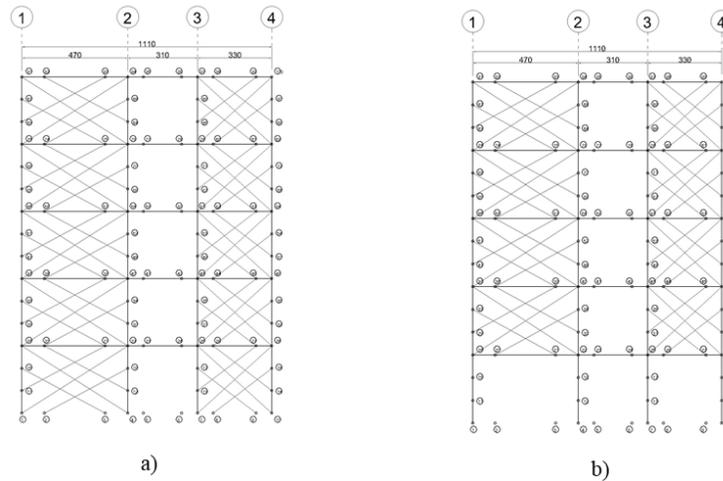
a) Infills at each story (“Infill” in Figures), b) Infills at each story except first story (“No1Infill” in Figures)
